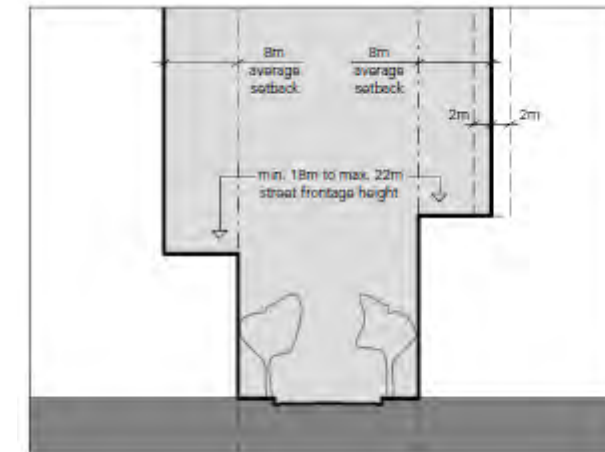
Street Frontage Height Type A. Above street frontage heights, buildings are to be set back a minimum of 6 metres, a maximum of 10m, with an average setback of approximately 8 metres
